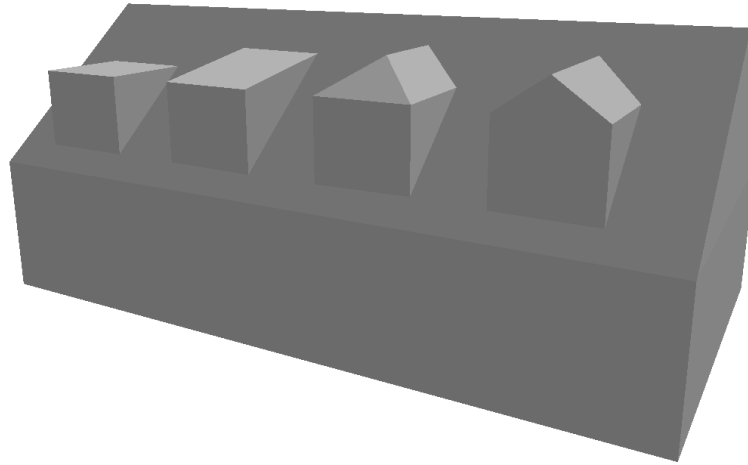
Building with dormers. From left to right (1) flat roof, (2) sloped roof, (3) hipped roof and (4) gabled hipped roof
